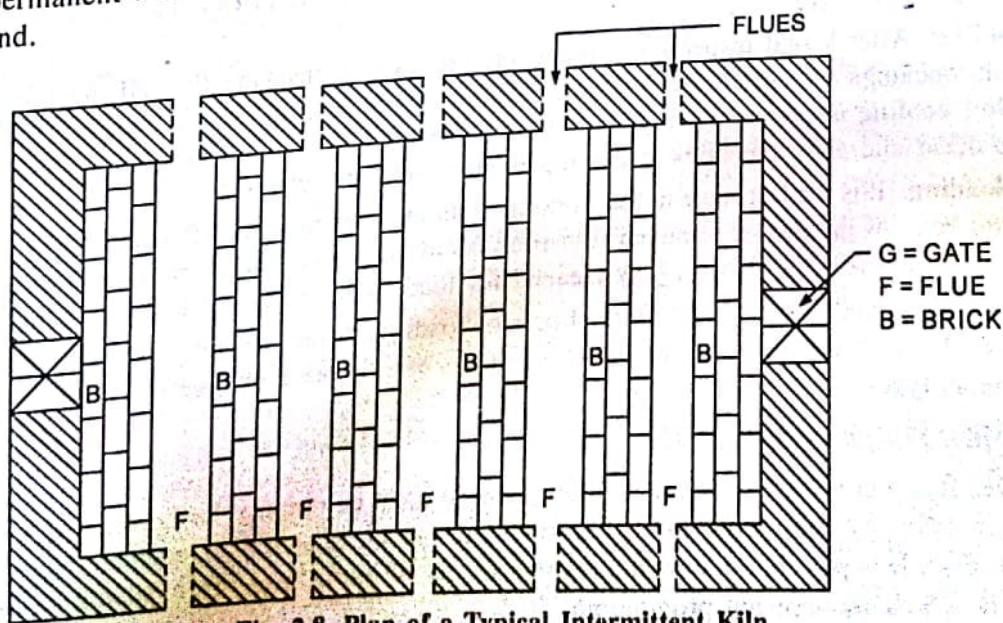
Plan of a Typical Intermittent Kiln.
